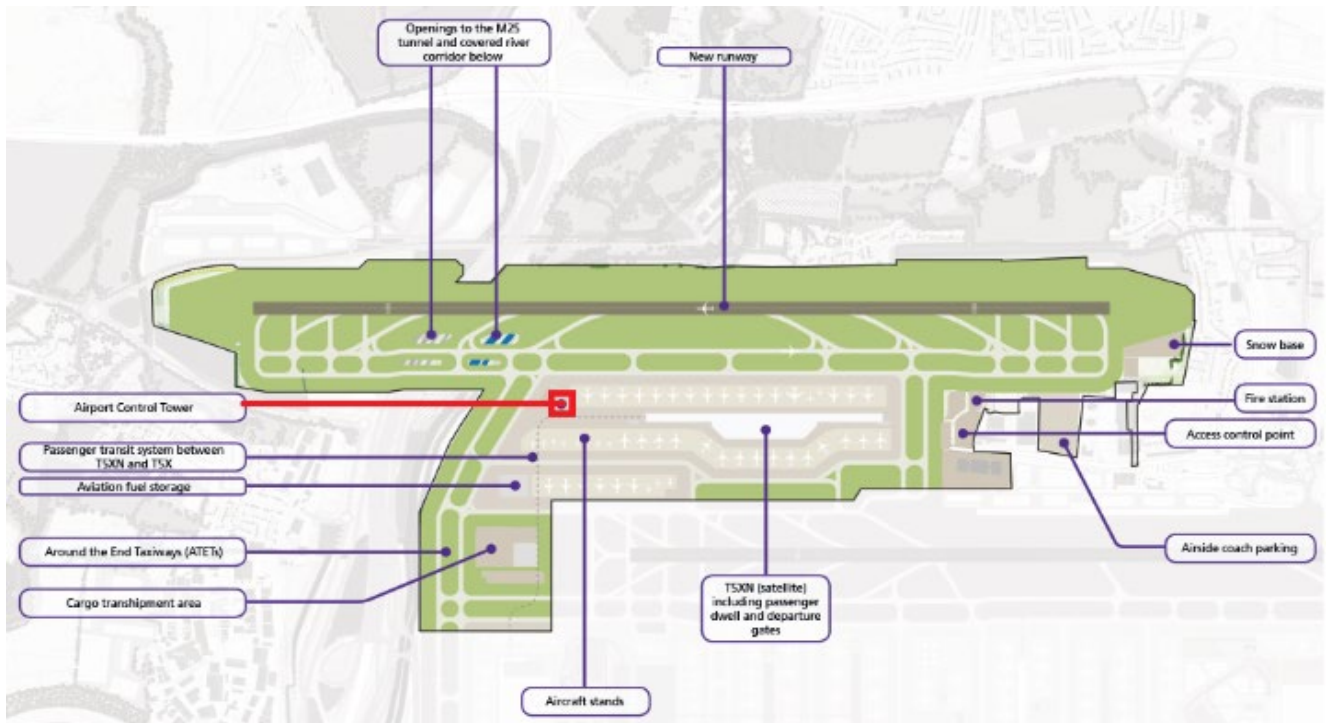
ATC Second Tower Location – 3<sup>rd</sup> Runway
